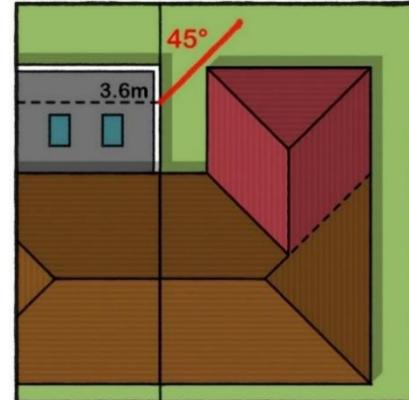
Two Storey Rear Extensions and New Development – Examples of the 45 degree rule
